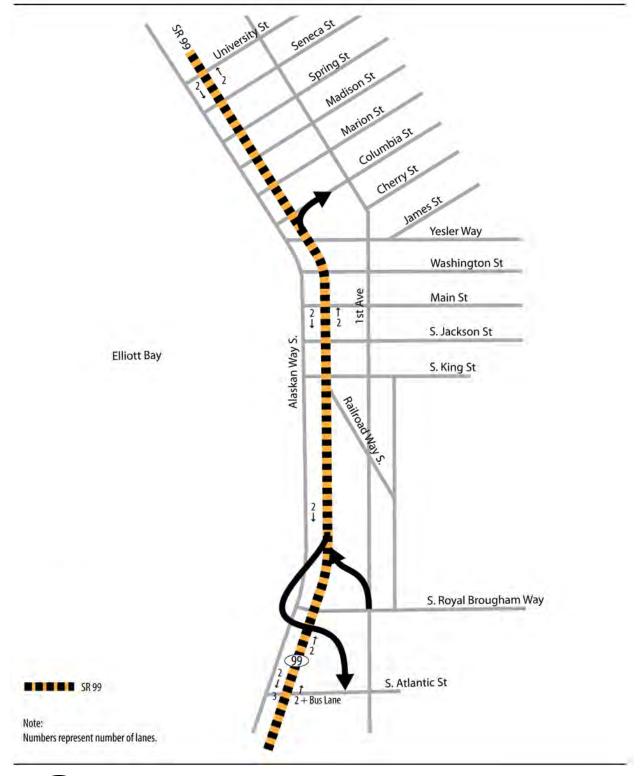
Elevated Structure Alternative Traffic Stage 5 Roadway Configuration (South)
